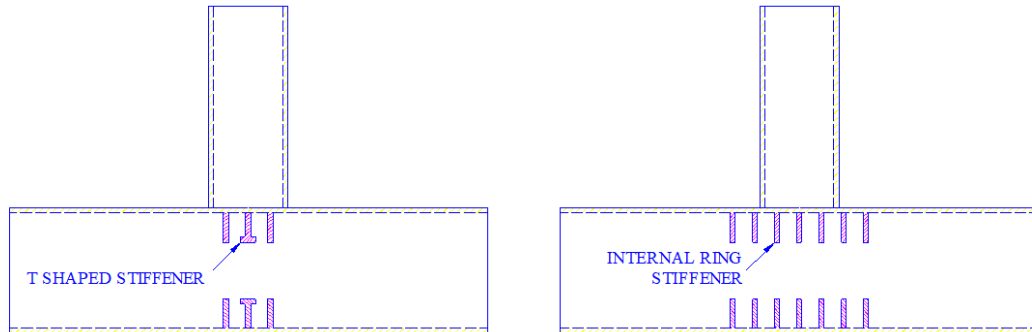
Joints with T-shaped Stiffener and Internal Ring Stiffener
